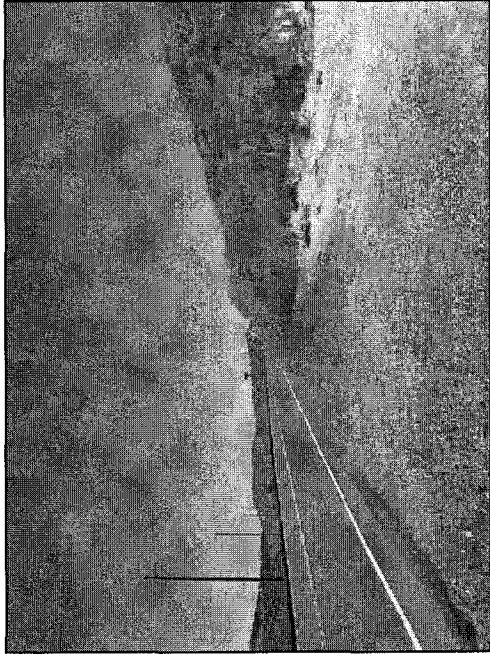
Overview of existing access road and proposed power alignment, facing north.
